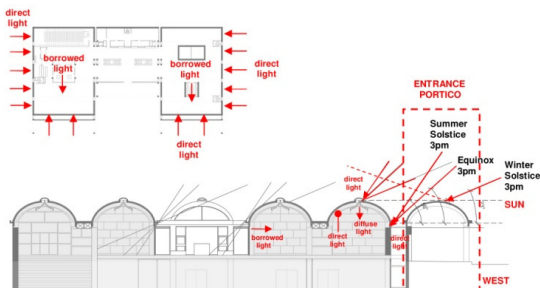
Light ingress shown on plan and section with the solar angles related to west orientated facade shown on section (original source for plan: [11]; redrawn by the author, diagrams by the author).
